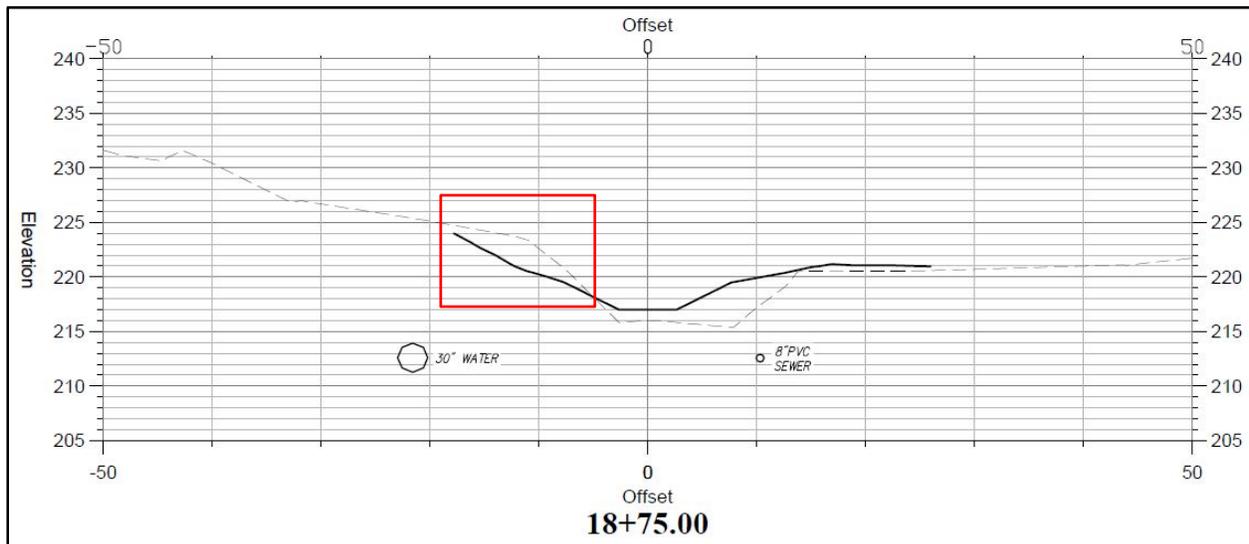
Cross section showing the proposed design channel (solid black line) will be excavated into the base of the high valley side slope (highlighted in red box). Note that the valley slope rises at least another 15 feet in elevation beyond the limits of the cross section. (From VHB, 2019, Drawing C-12)
